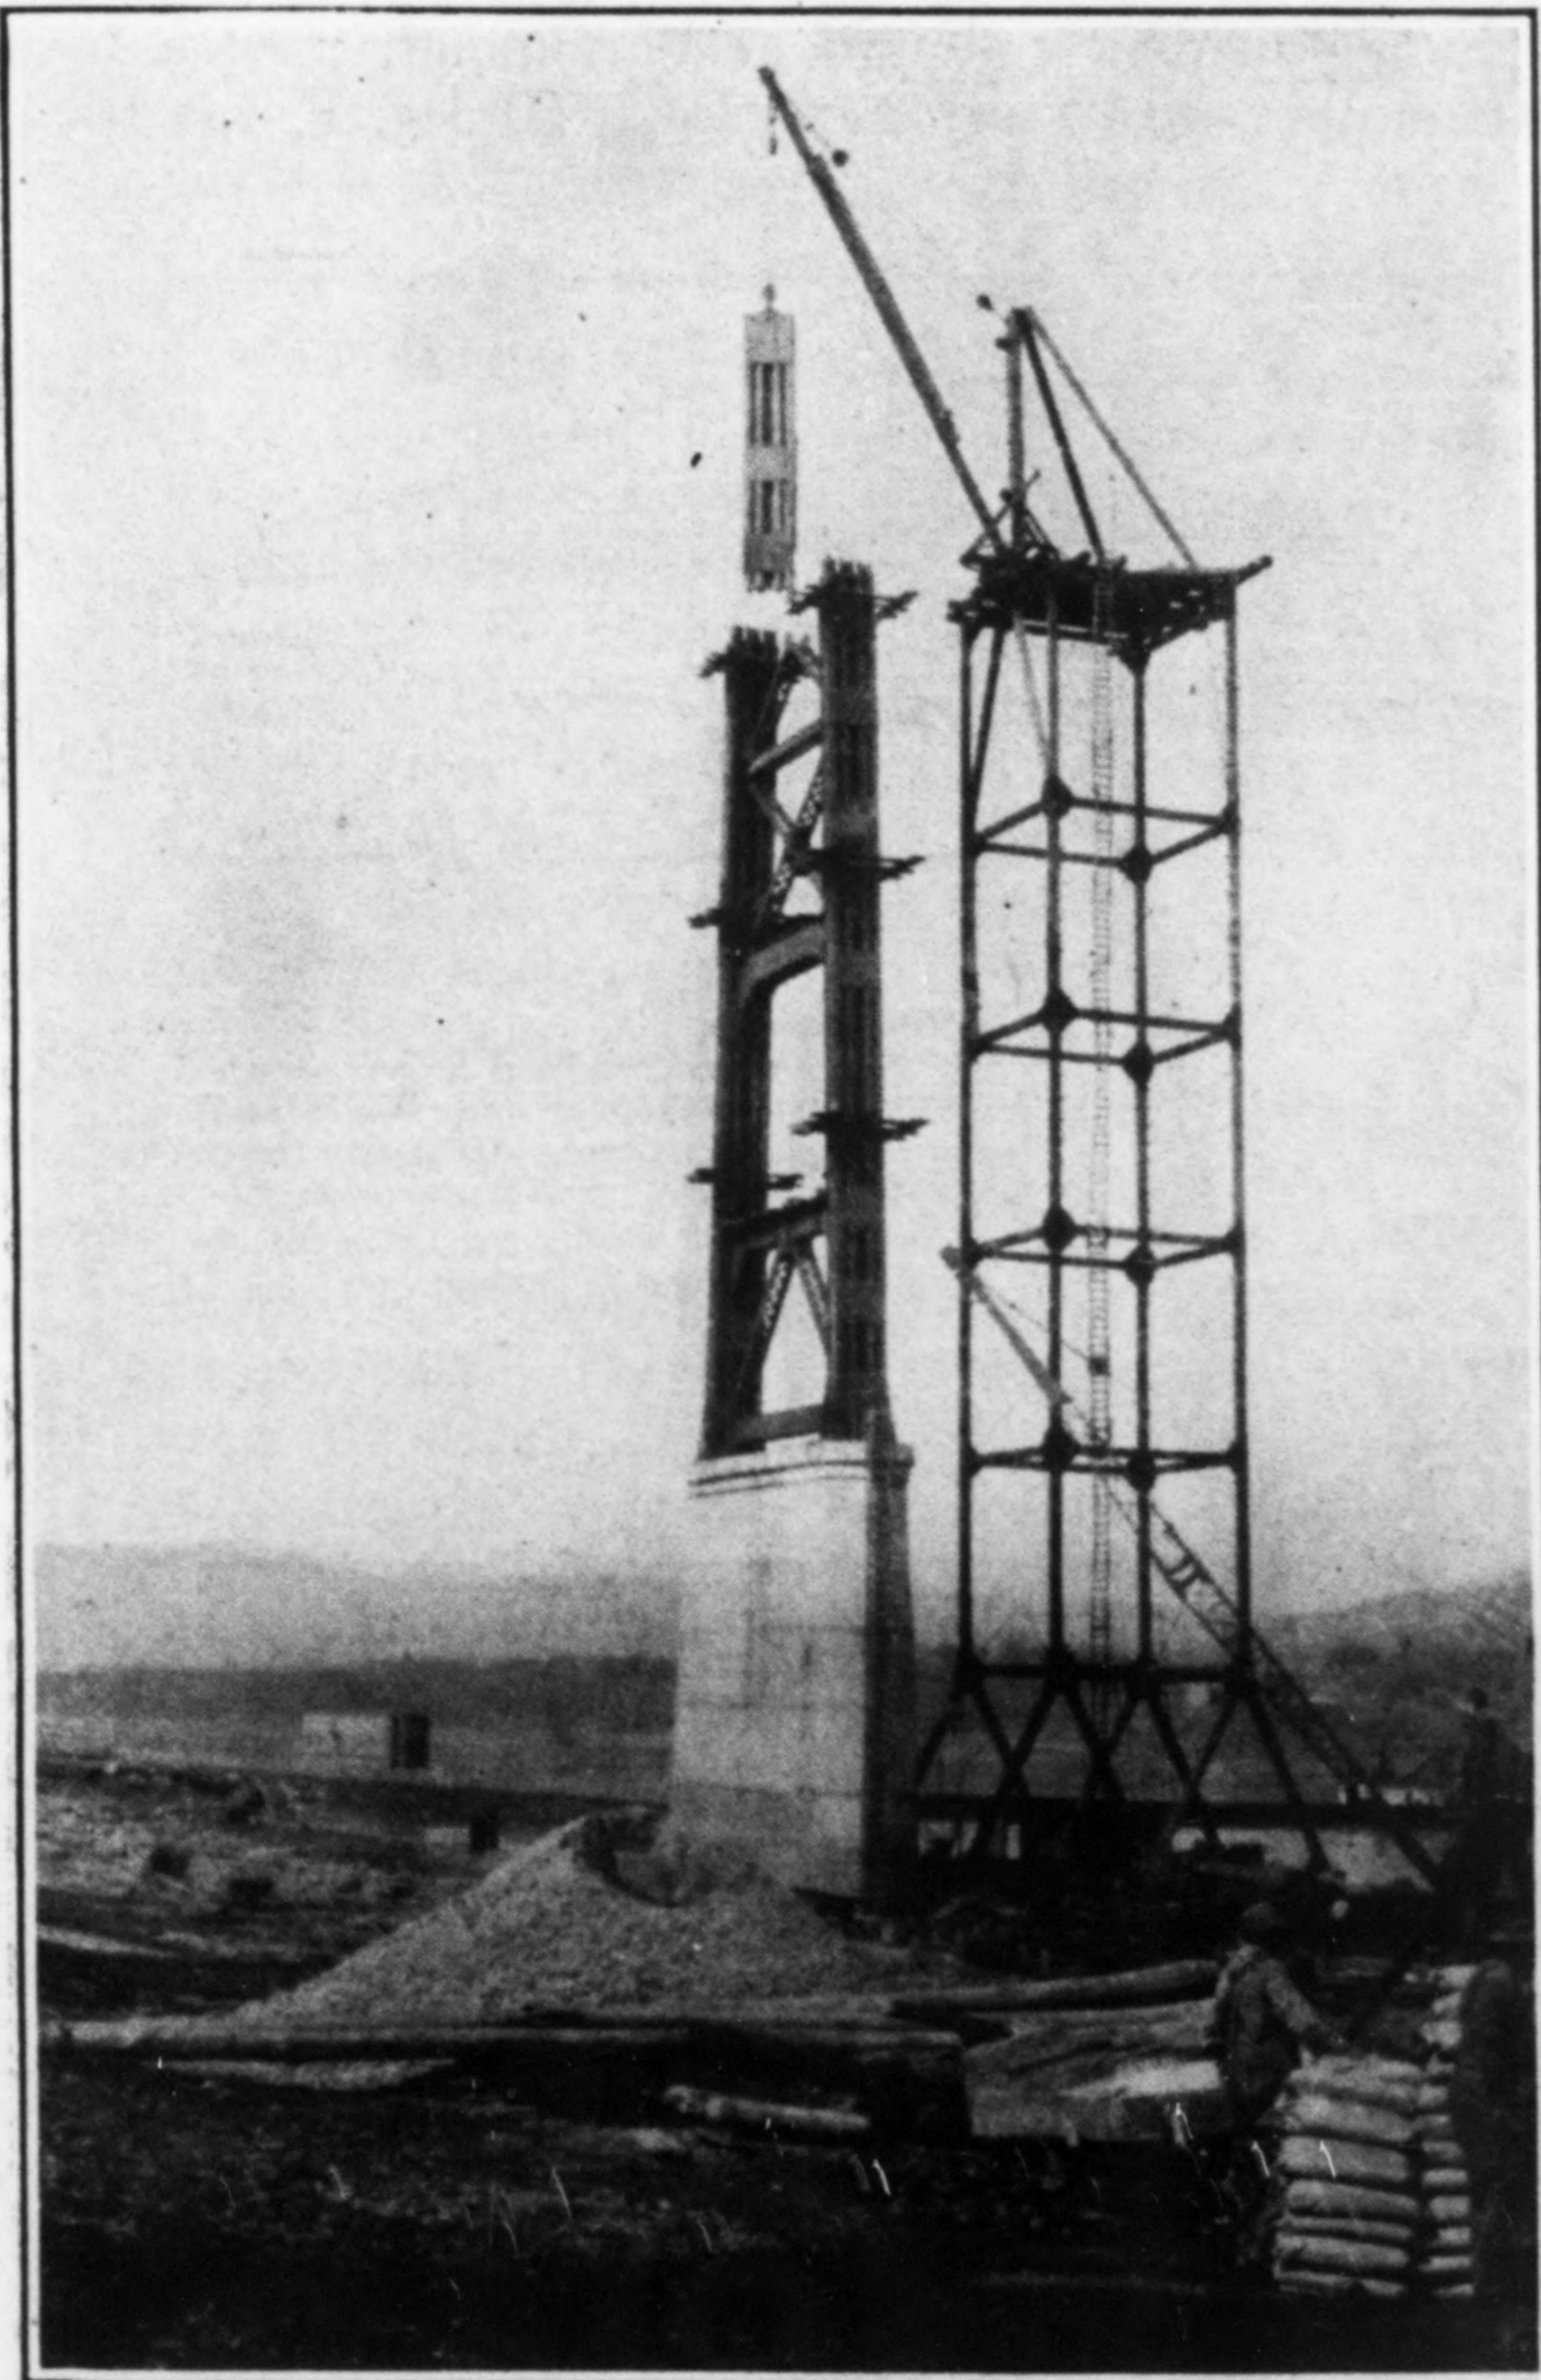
FLOATING DERRICK WITH 150-FT. TOWER RAISING MAIN TOWER SECTION
